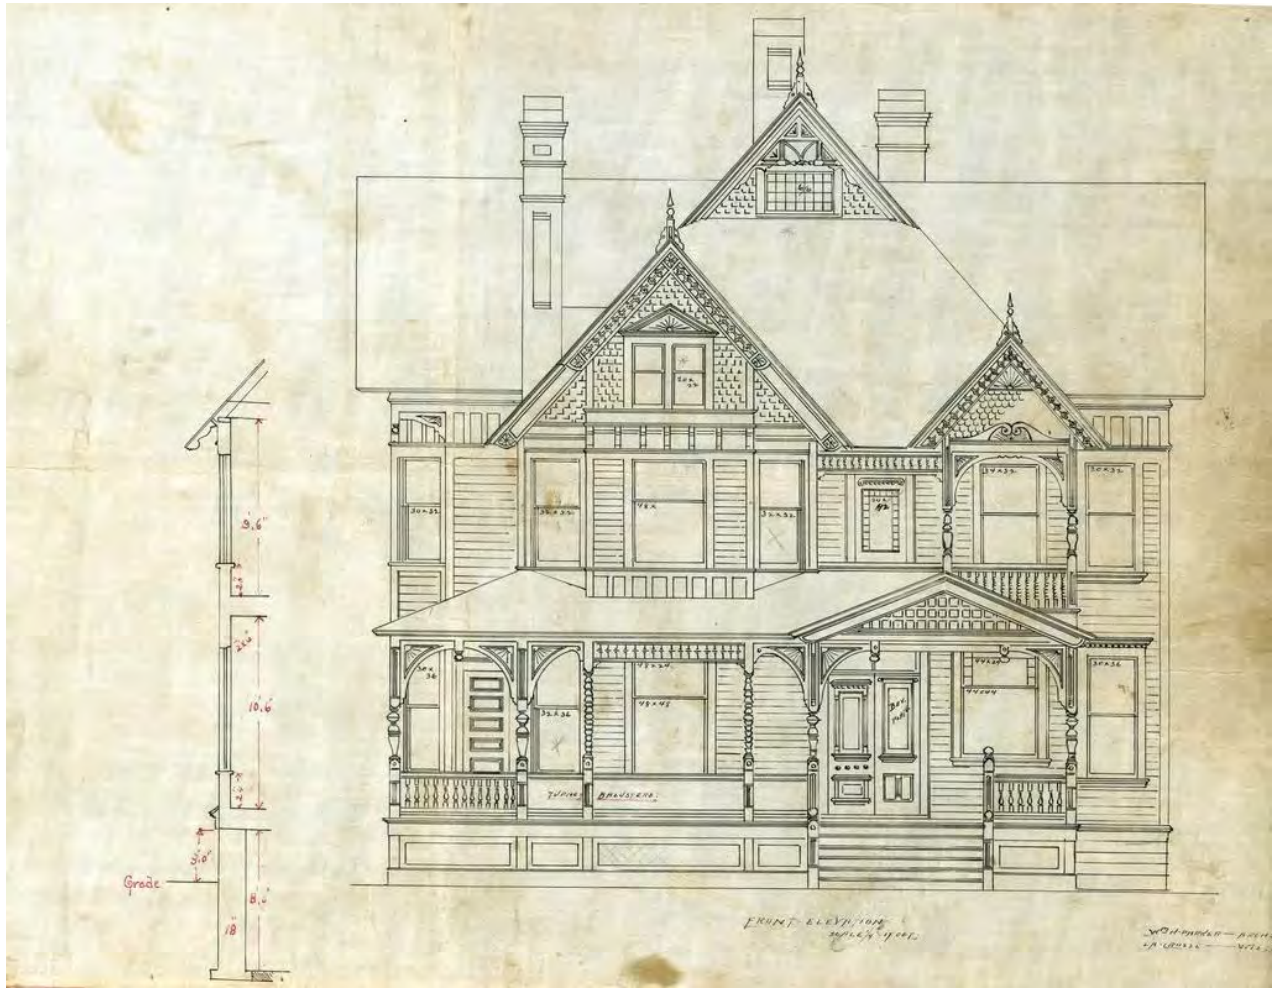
Front (east) façade drawing of Johnson House, 1892.
